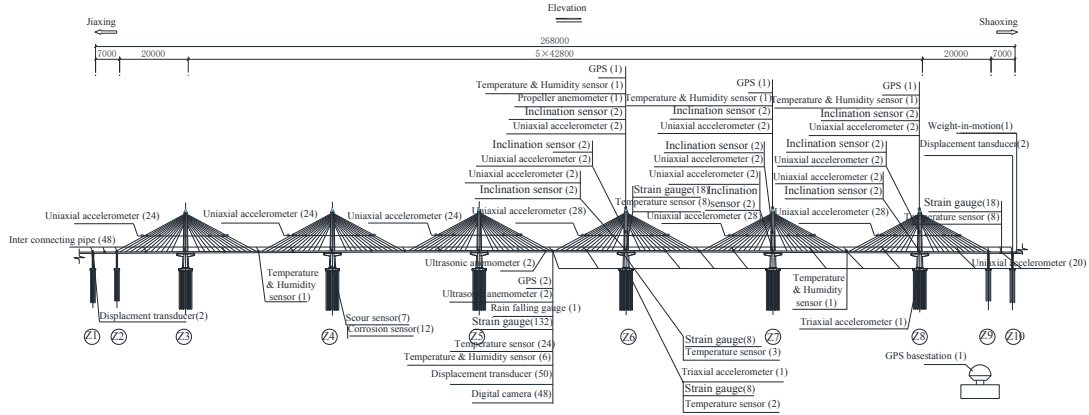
Layout of sensors for a six-tower cable-stayed bridge in China
